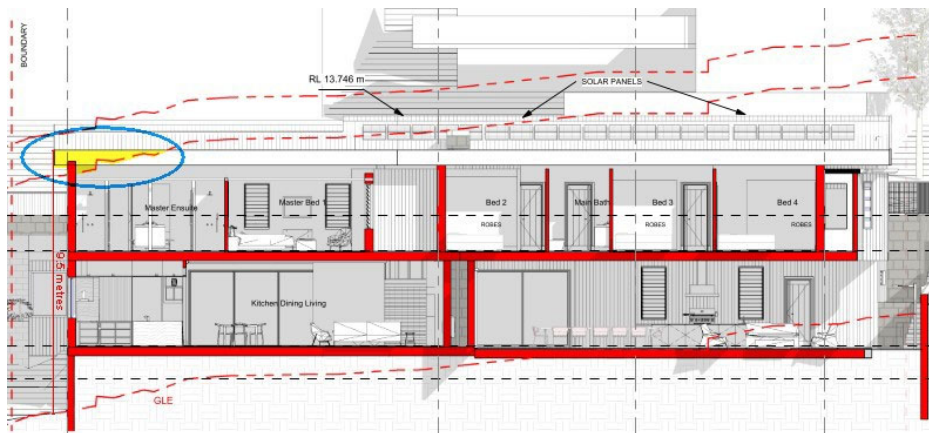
Excerpt from the section highlighting the extent of building height above 8.5 metres.
